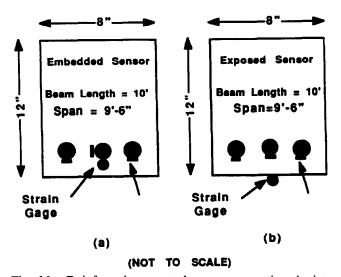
Reinforced concrete beam cross-section depicting location of sensors (Maher and Nawy<sup>25</sup>).
